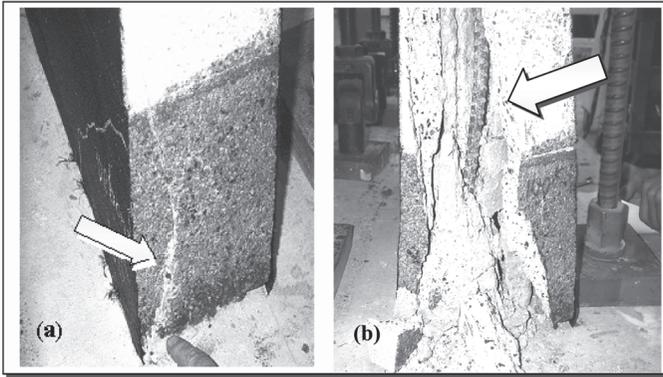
Premature Compression Failure of Masonry Units at Wall Toes
